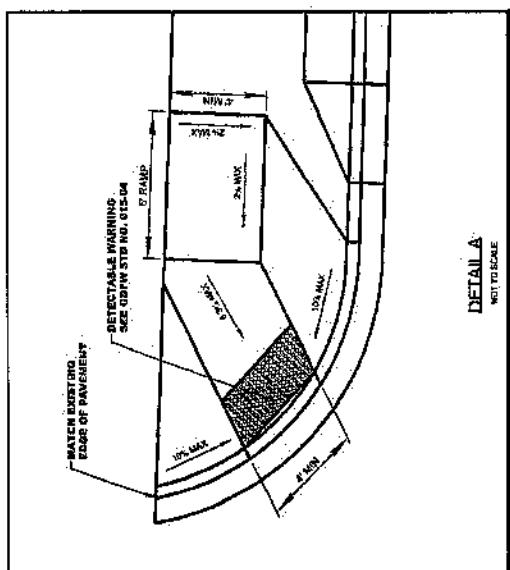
B: MANGILAO PEDESTRIAN CROSSING CURB EXTENSIONS PLAN
